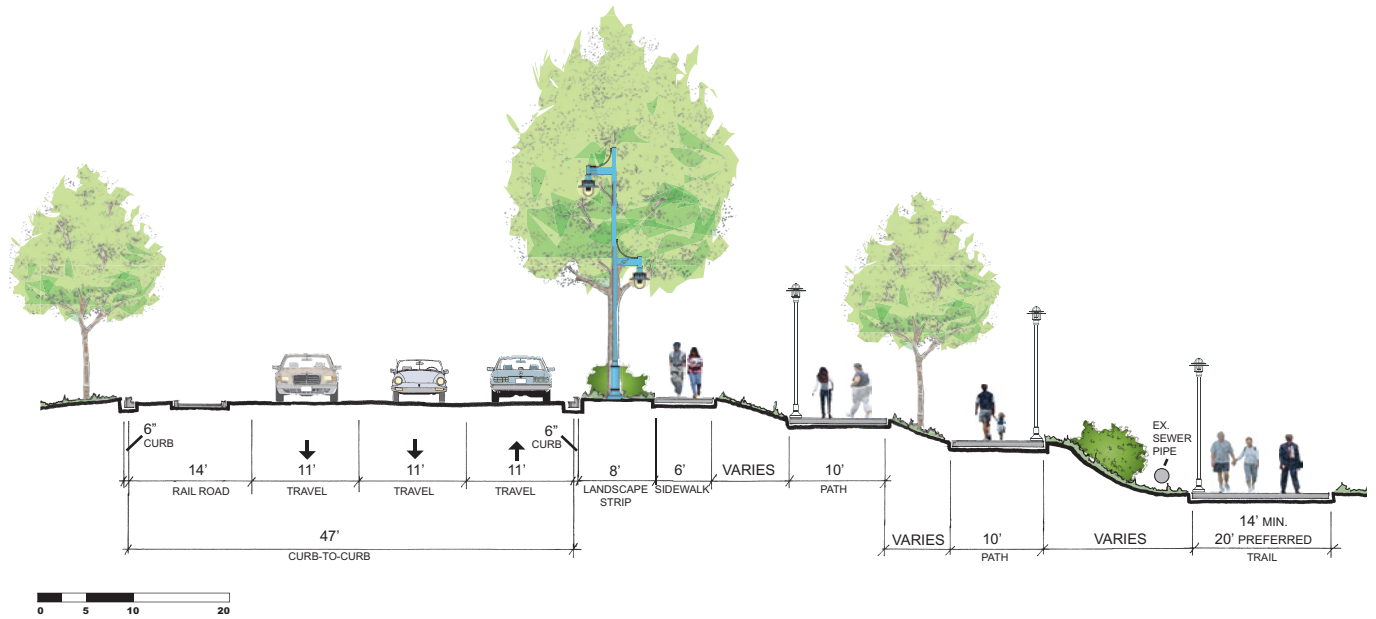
D.50: Partial Cross Section of Mare Island Causeway at Proposed Multi-purpose Trail Ramp Connection to Promenade Extension
